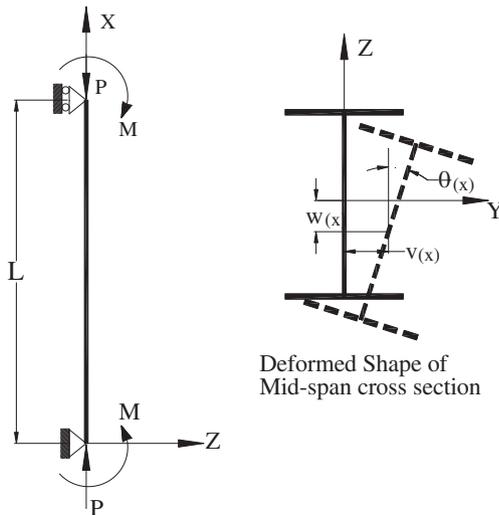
Beam-column boundary conditions, loads, axes and deformed shape.
